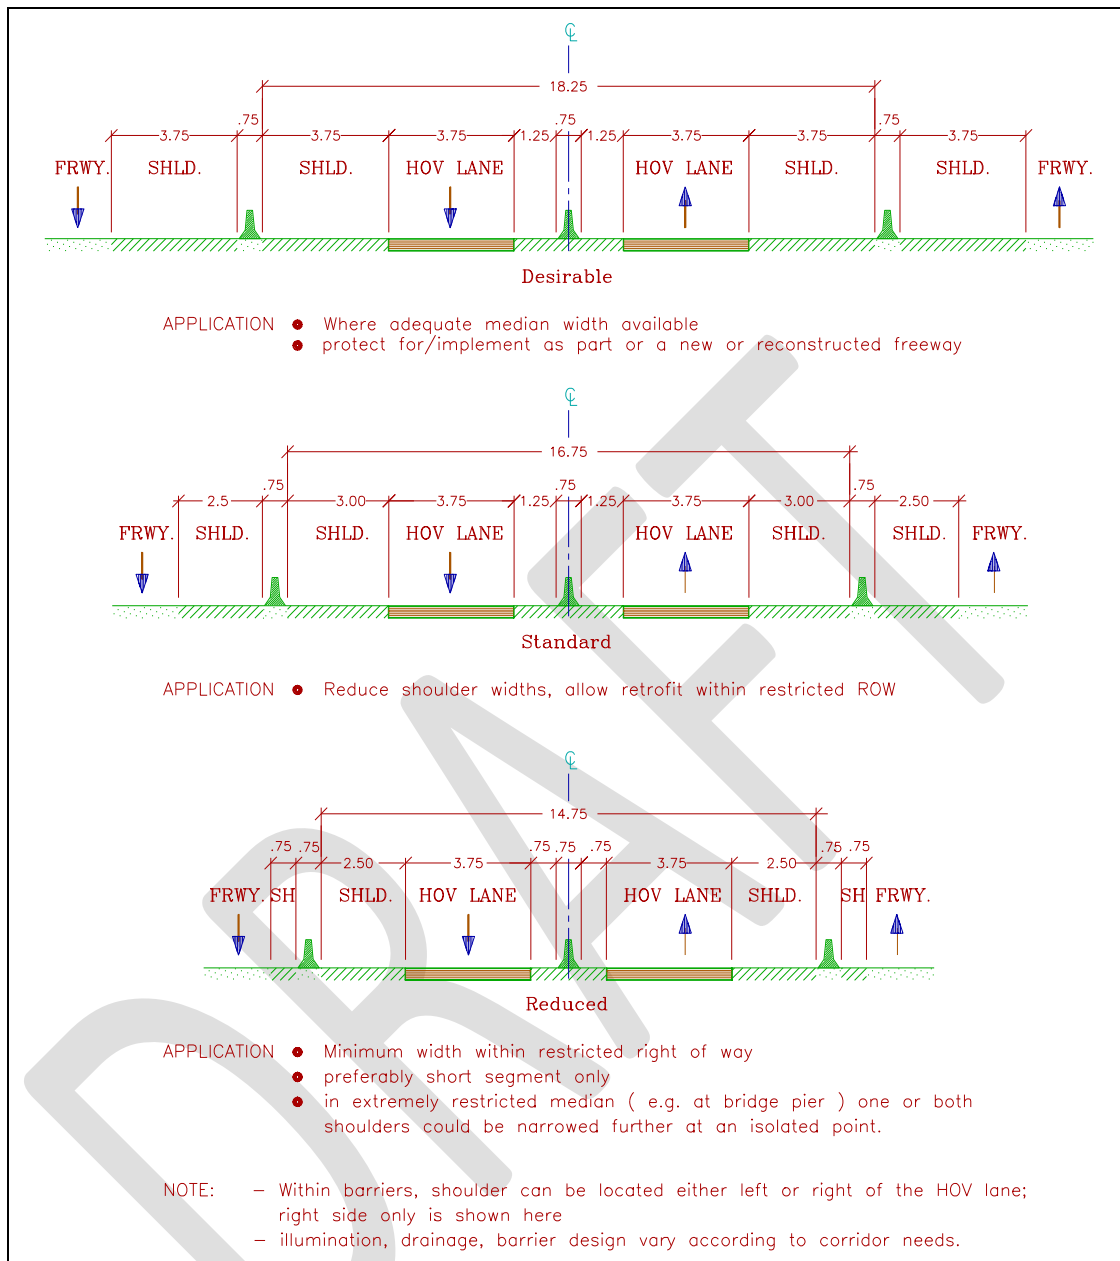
Examples of Cross Sections of Barrier Separated HOV Facility
